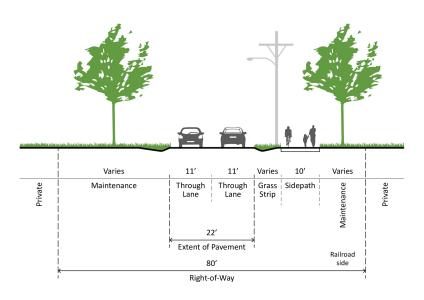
Proposed Typical Street Section for Clopper Road East of Clarksburg Road
